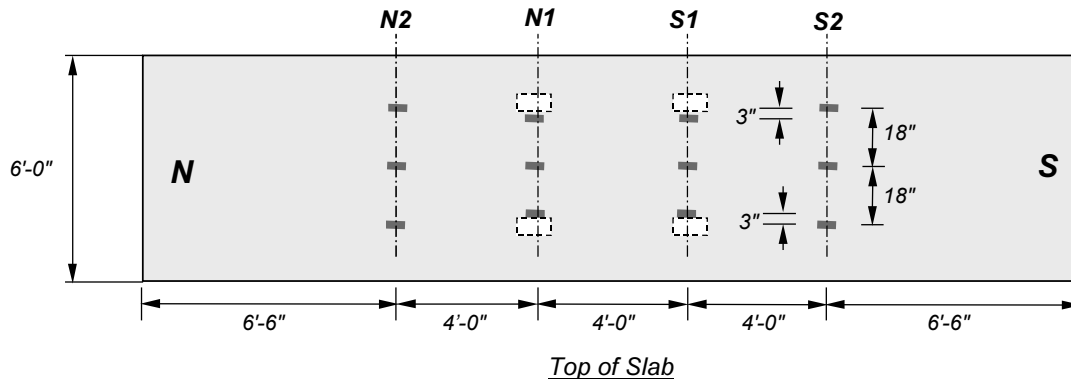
Position of Instrumented Sections for Flat-Slab Specimens
